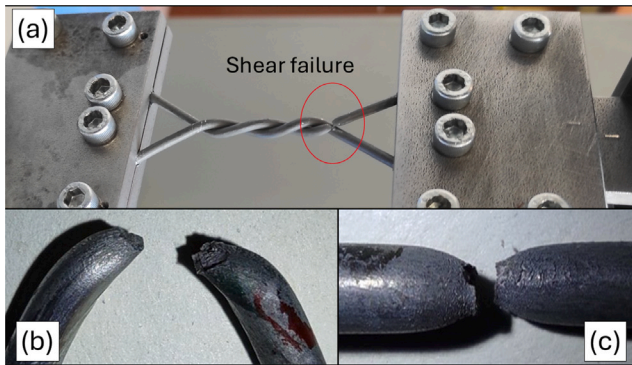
Tensile testing of double-twists. (a) Shear failure develops at the edges of the DT. Zoom on the failed wire pieces in (b) shear and (c) necking.
